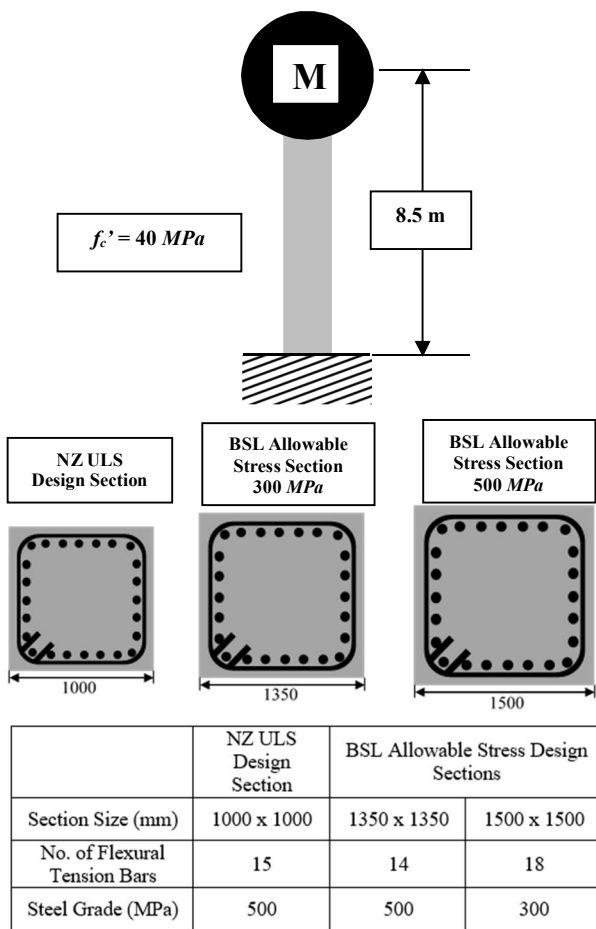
Comprison of sections derived by New Zealand ULS vs Japanese BSL Allowable stress design for a cantilevered reinforced concrete column.
